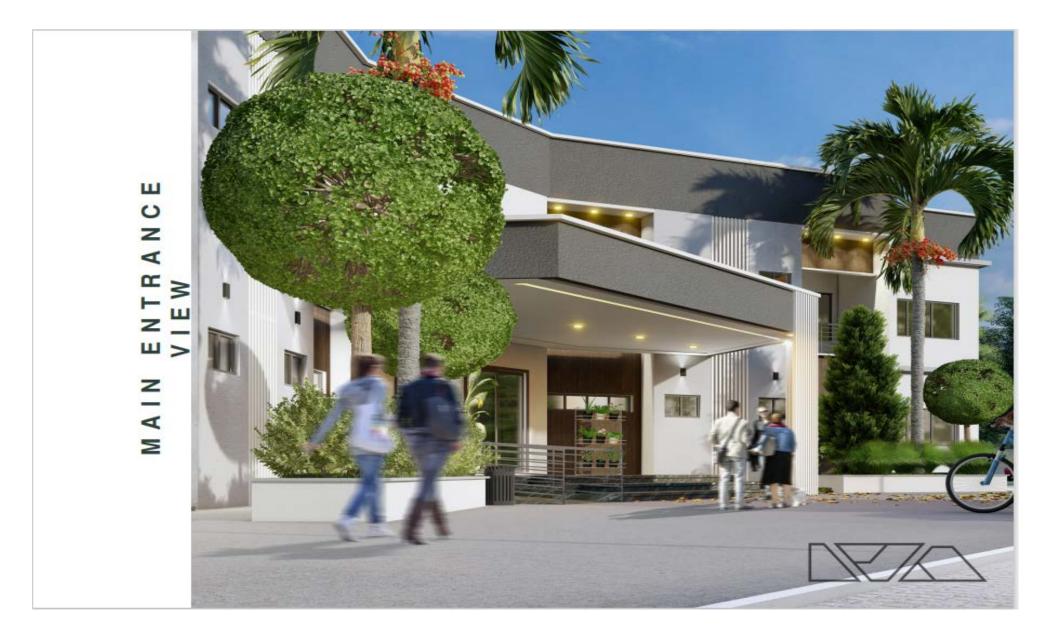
Proposed 3D Design of the ACEPHAP Project
